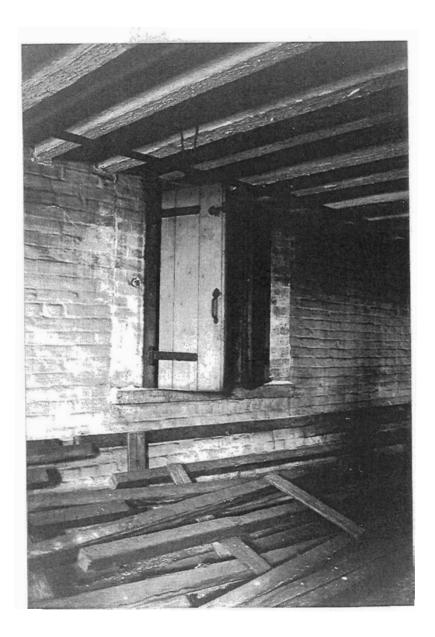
Floor 1 of Malt House, showing low ceiling, heavy timber framing and concrete floor. Source: *Historica Research Limited, December, 1993
